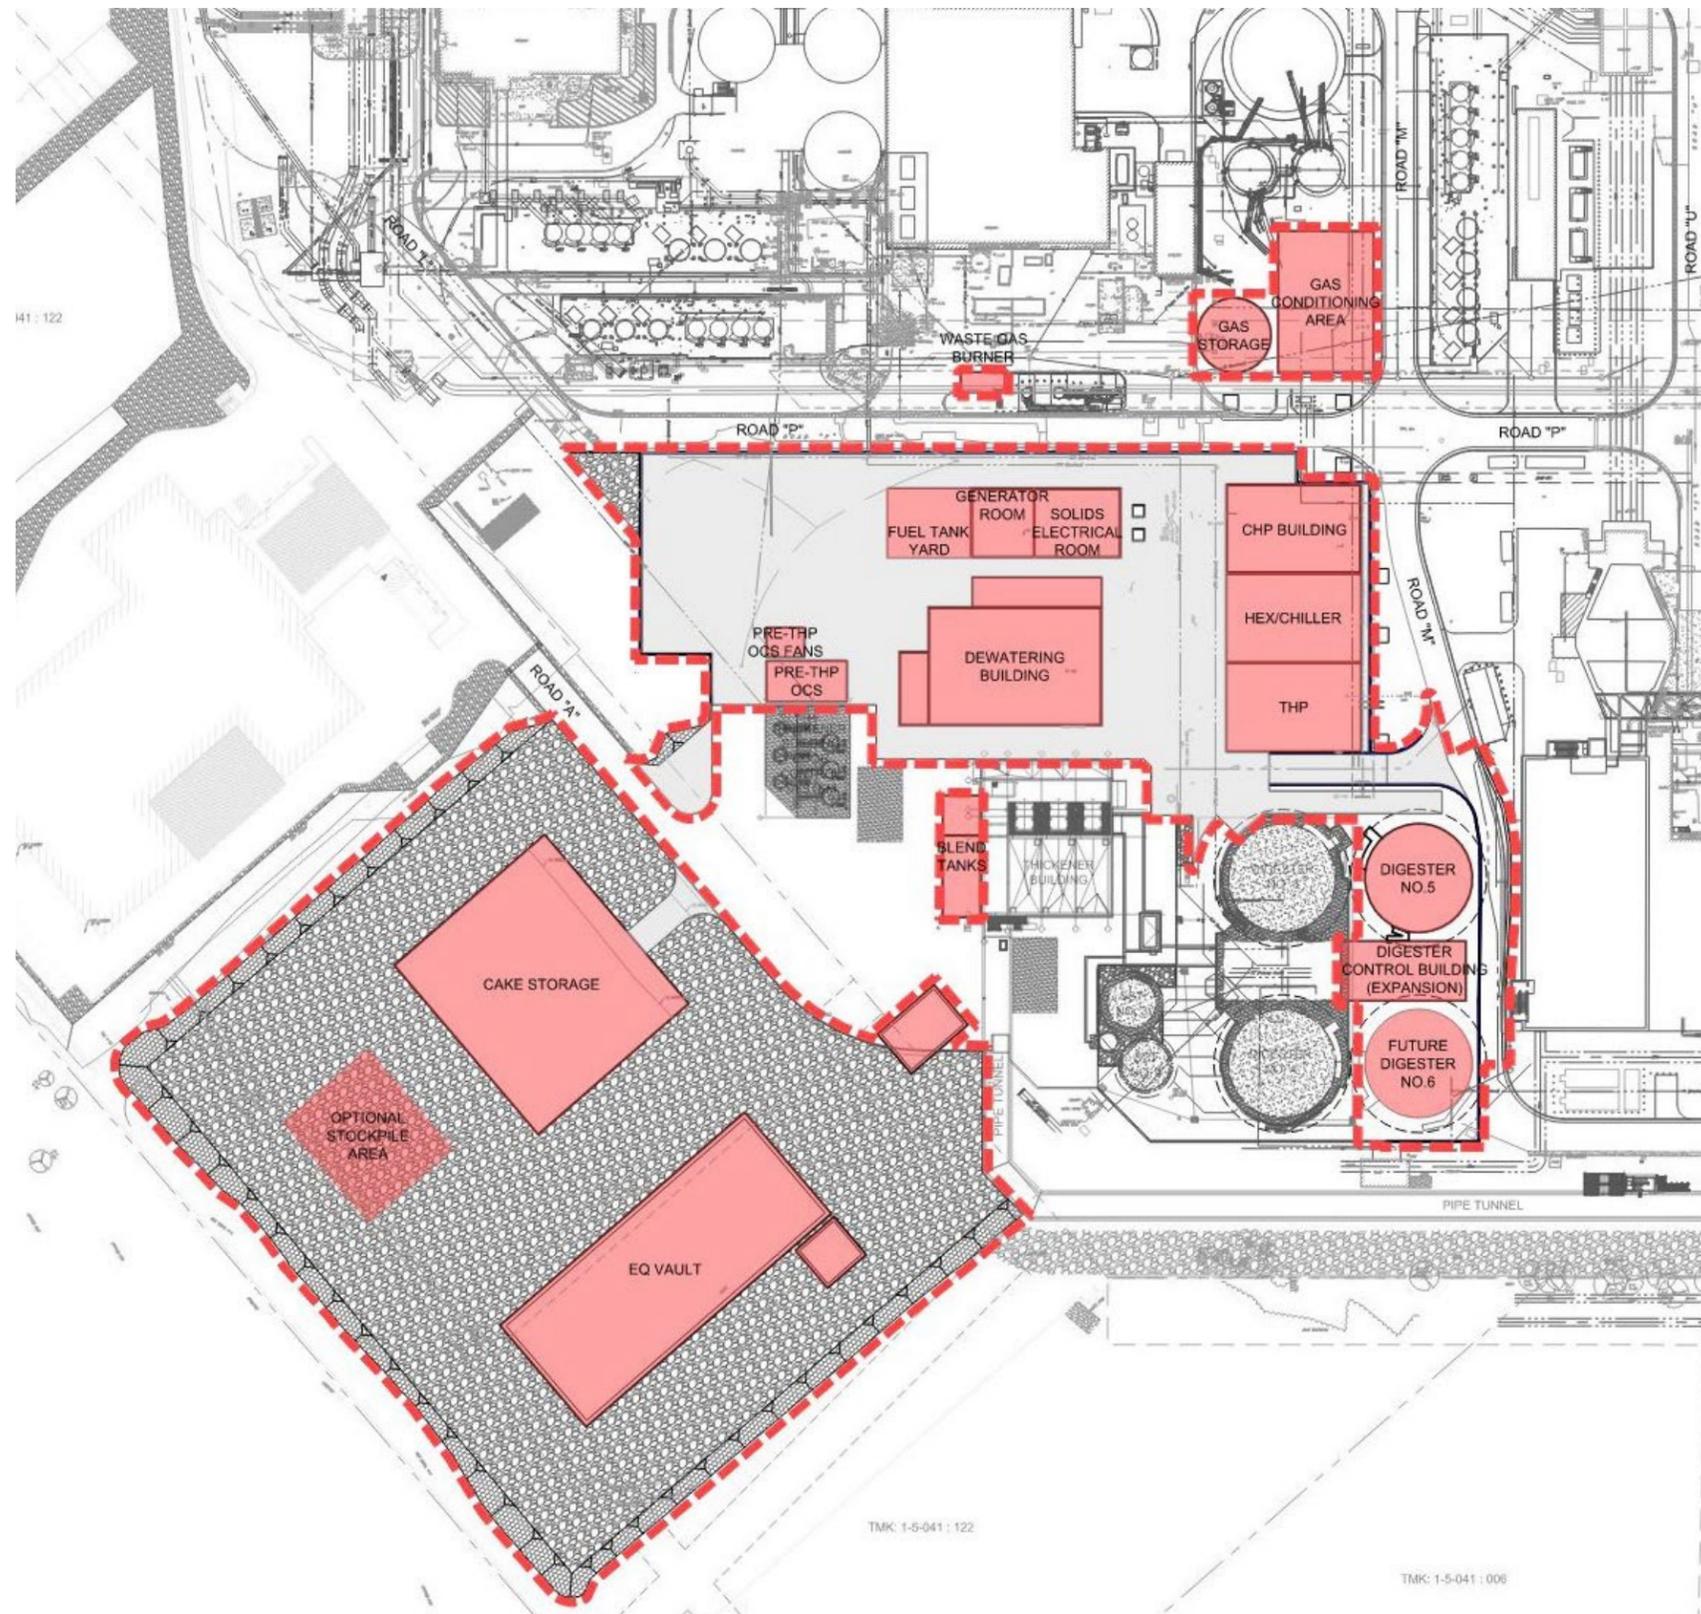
Conceptual Site Plan – Phase 2 Solids Stream Treatment Process Facilities
